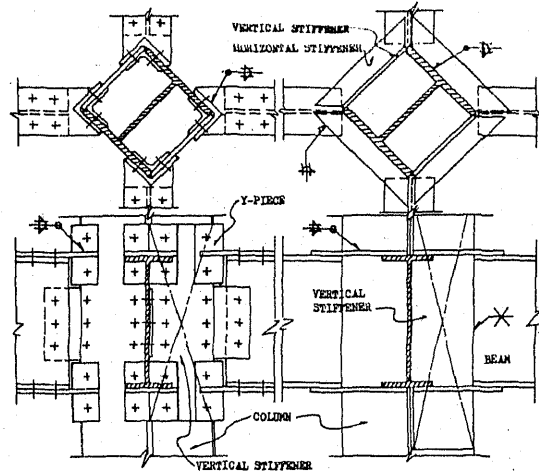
TYPICAL DETAILS OF BEAM-TO-COLUMN CONNECTION IN DIAGONAL COLUMN CONSTRUCTION
